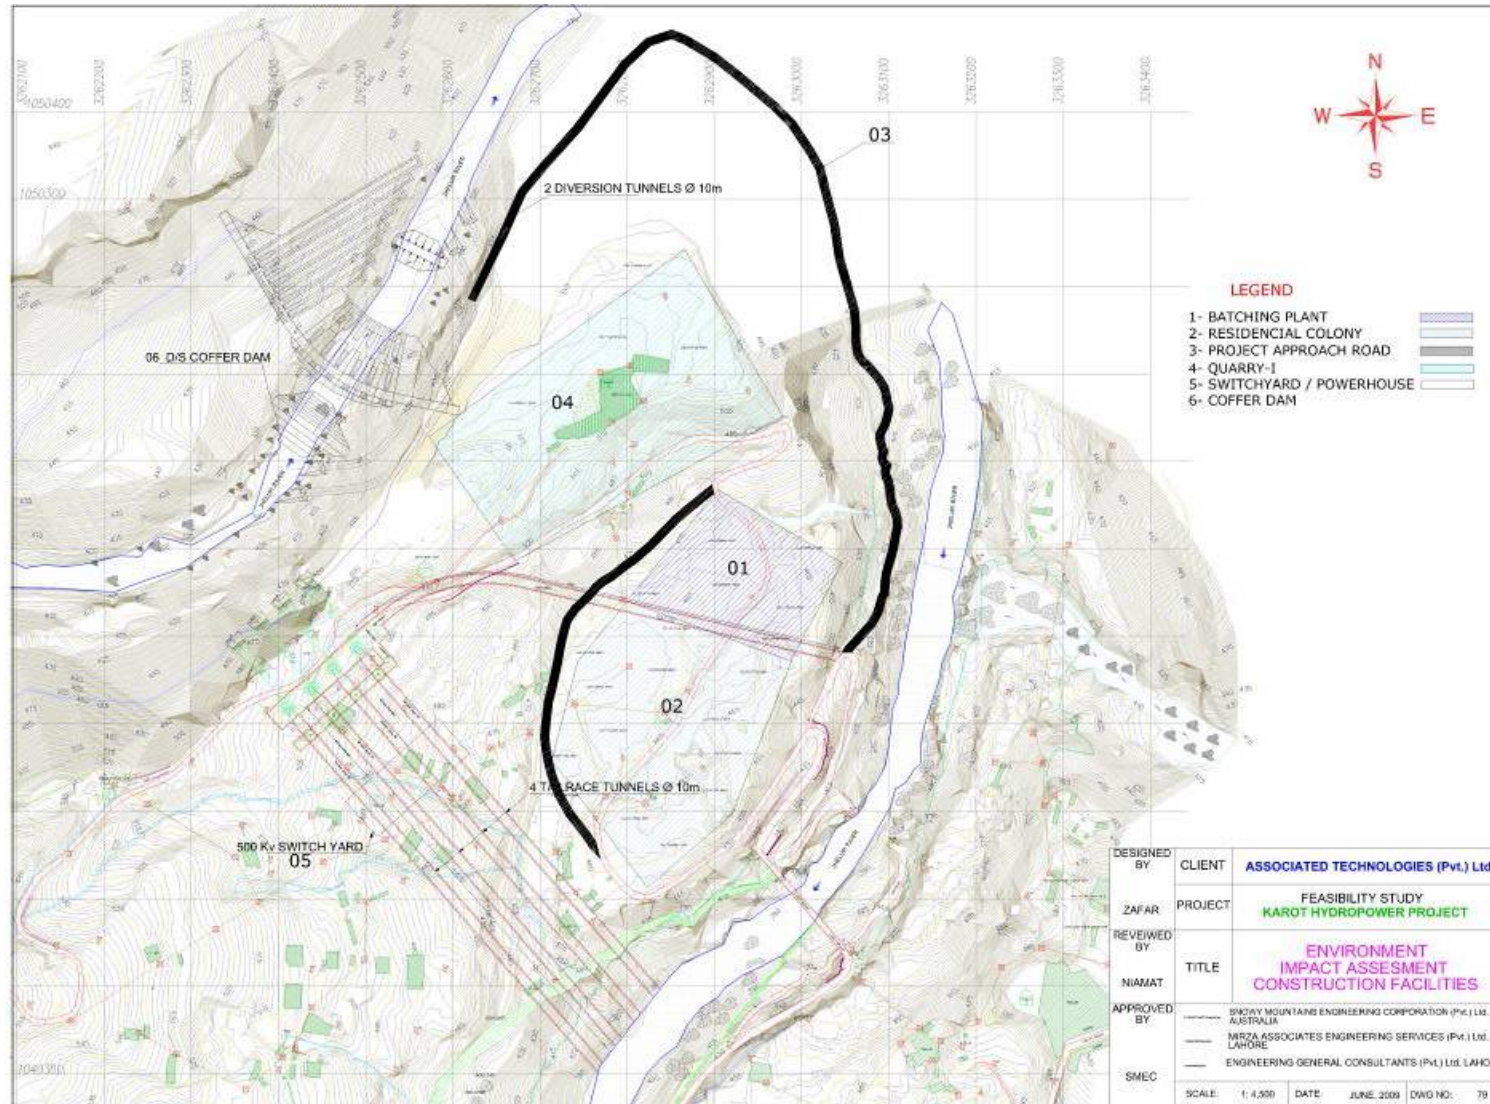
Environment Impact Assessment (Construction Facilities)
